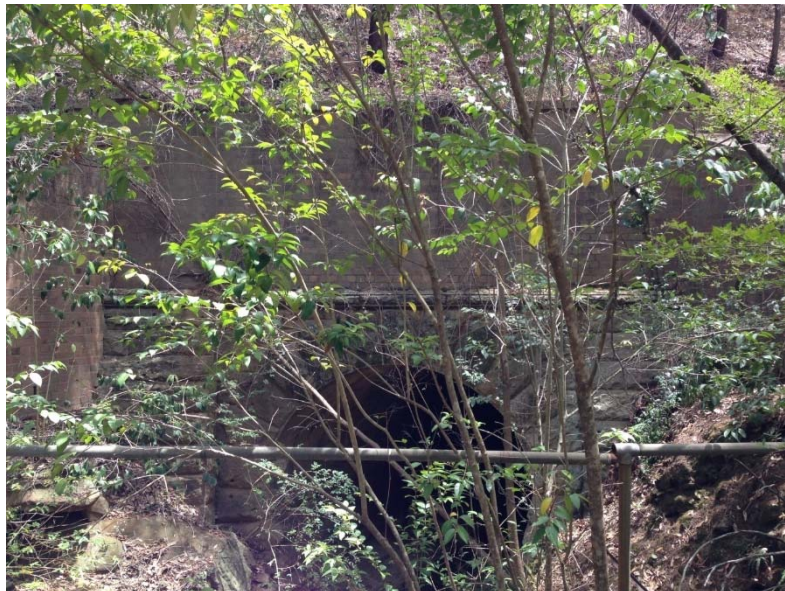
Loop line culvert with wingwalls at 89.629 km
